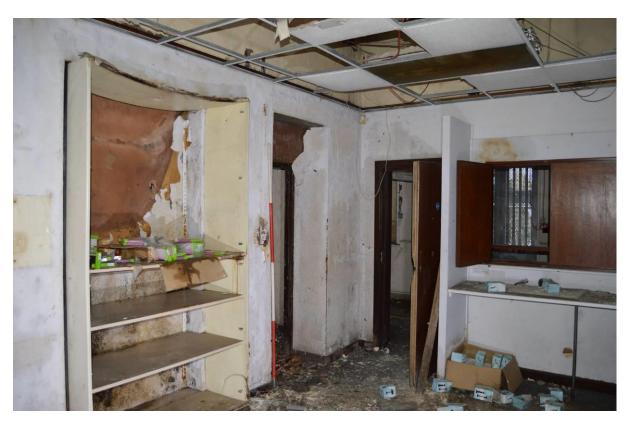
Reverse view in room G8. Scale 2m. Facing south east.
